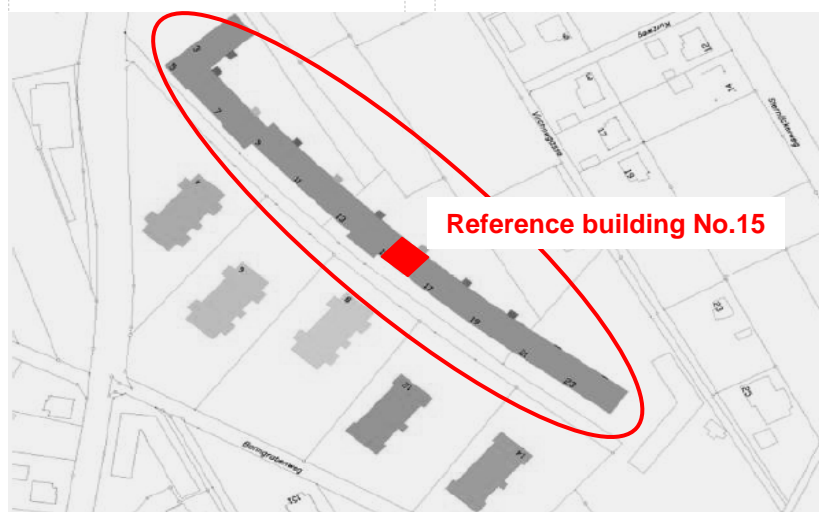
Site plan showing the entire area and location of building “Dieselweg 3-19” [source: Hohensinn ZT GmbH]
